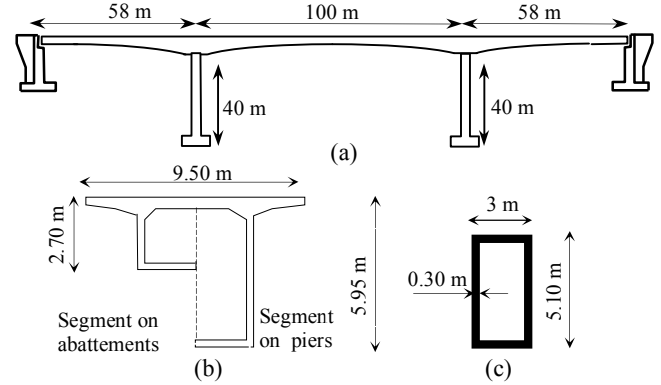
Description of Bridge: (a) Elevation of bridge, (b) Cross-section of segments, (c) Cross-section of piers
